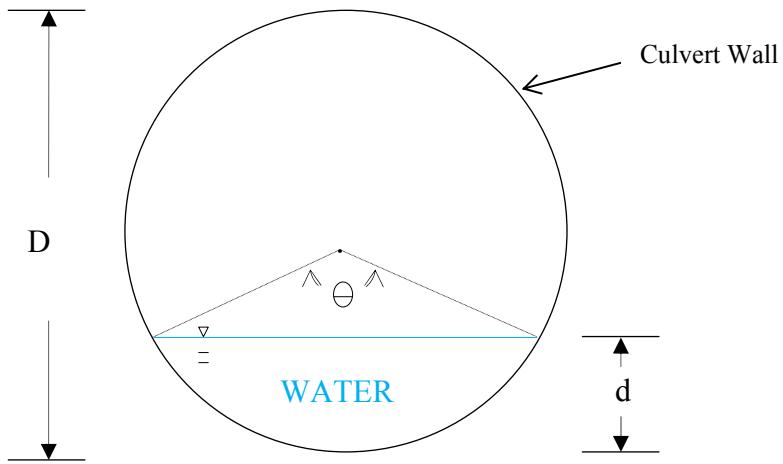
Defining Angle θ for a Circular Culvert Cross-Section (Khan 1986)
